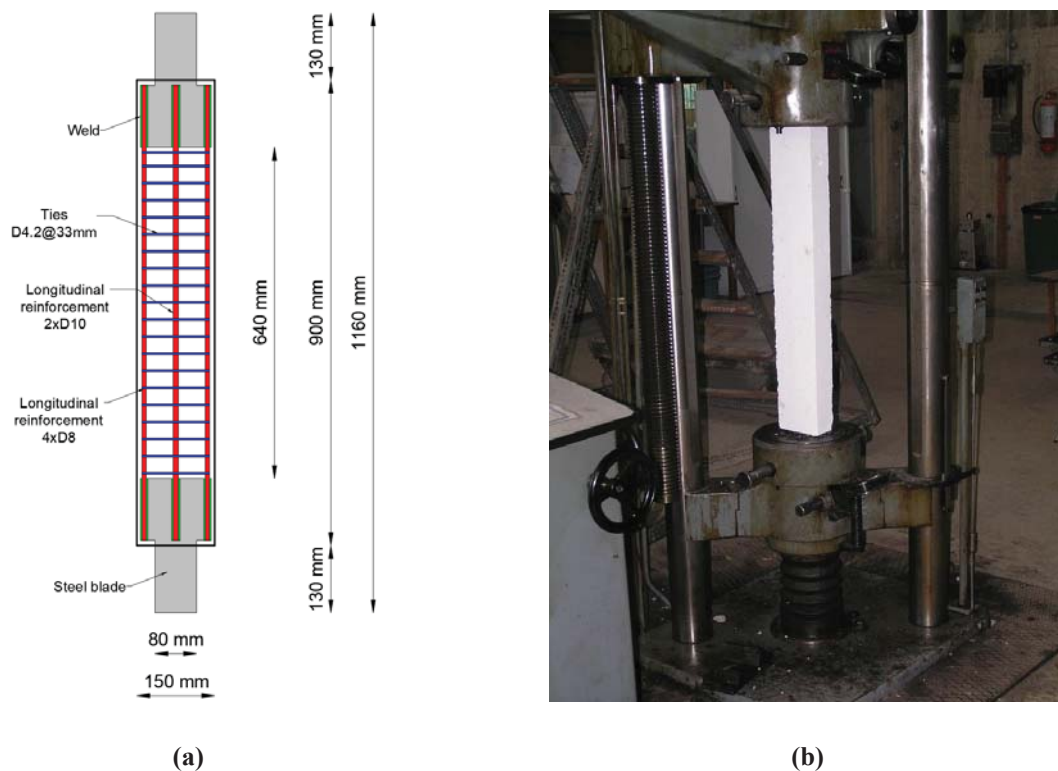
(a) Vertical reinforcement layout (Reinforcement differs for each specimen. Example shows a typical longitudinal reinforcement 4xD8+2xD10.), (b) Test setup for tensile loading.
